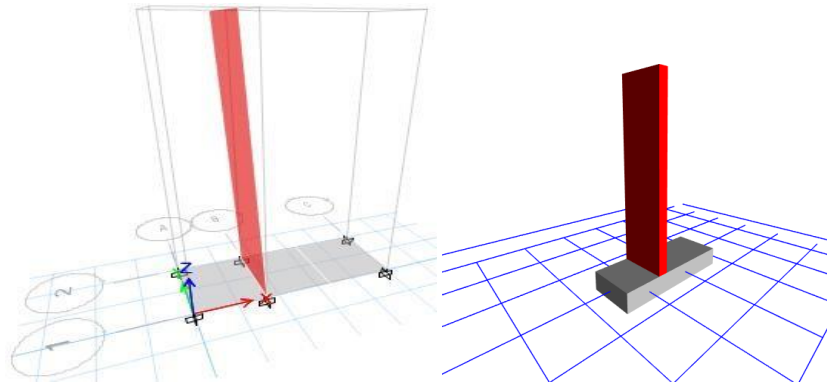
Deformed shape after adding load and rendered view of retaining wall without shelf.
